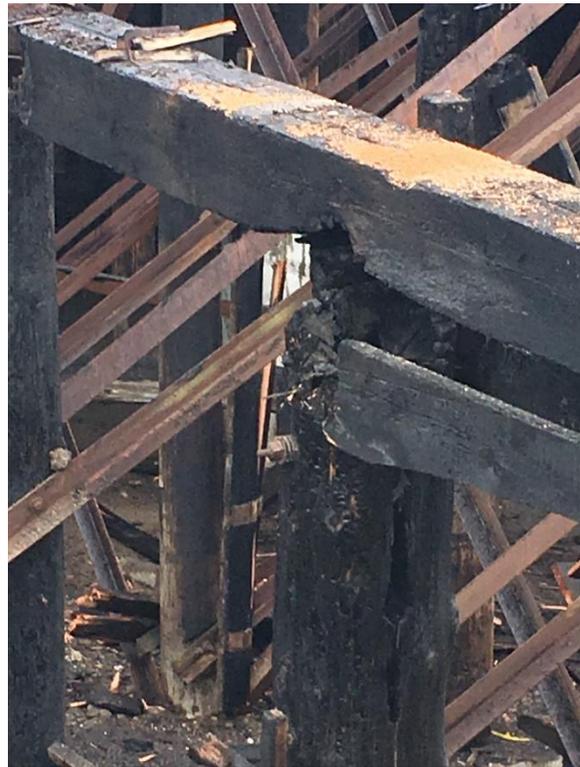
Wharf area downstream of Access Trestle A with timber deck and stringers removed, exposing fire damaged piles and caps below.
